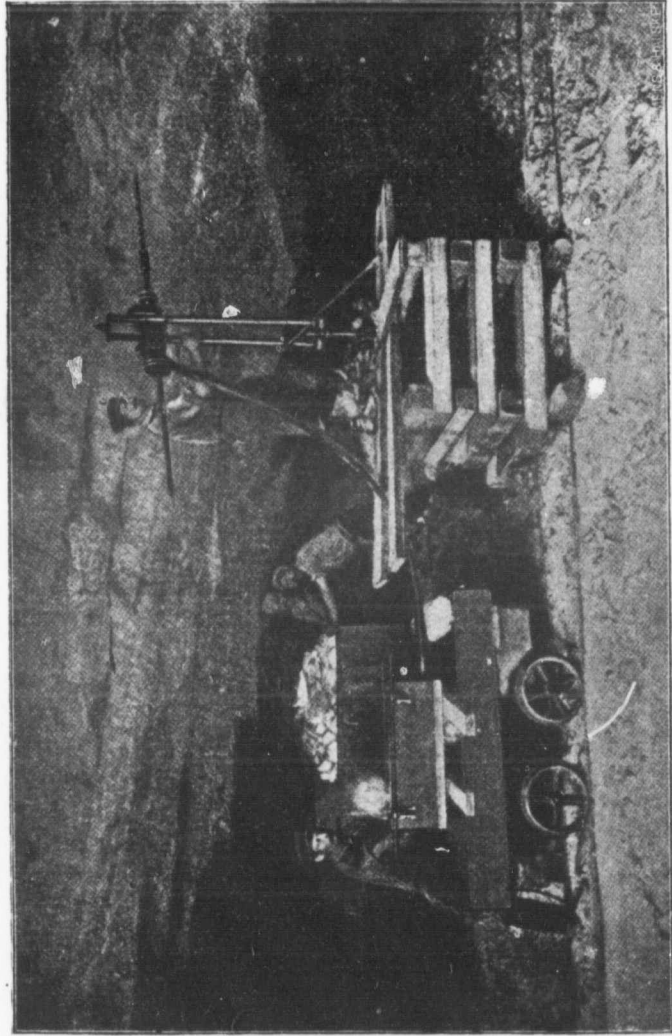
Rotary Rock Drill with Electro-Motor in use in the Saburg Mine at New Strassfurt.*—In order to bring the drill into position, a staging of wooden beams is used. The motor-box is on a trolley, so as to enable holes to be bored in the crown of the drive.
